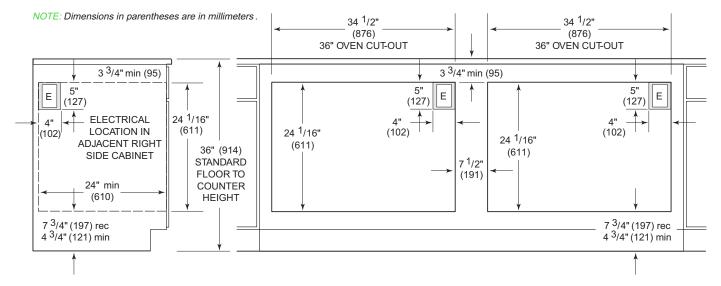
Undercounter Cutout Dimensions and Electrical Placement for SO36
